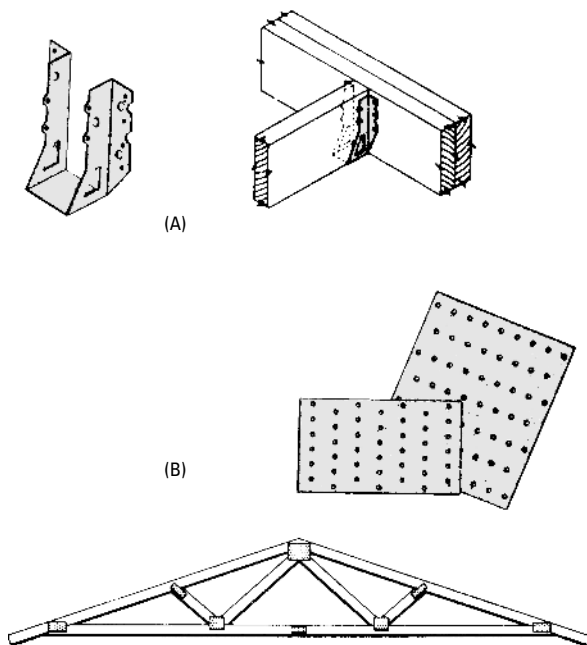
(A) One useful kind of framing fastener is the joist hanger. (B) Perforated plates such as shown can be used to make trusses. (Courtesy of Teco.)
